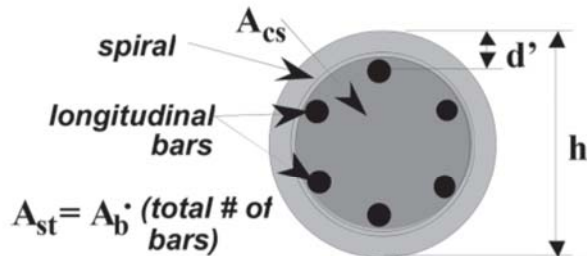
Dimensions for calculation of balanced design strength for circular section columns with spiral reinforcement.
